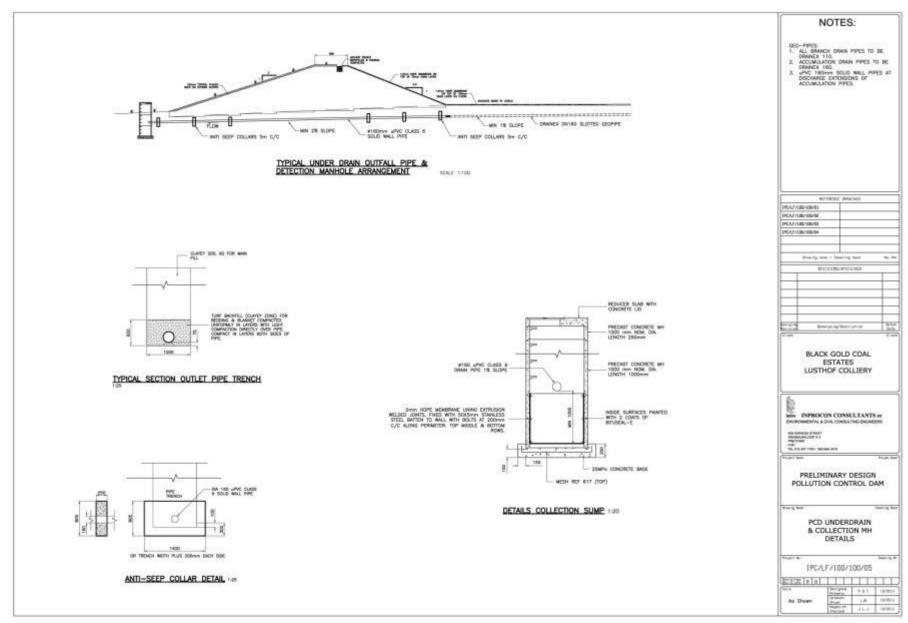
(e): Pollution Control Dam - Underdrain and Collection Man Hole Details.
